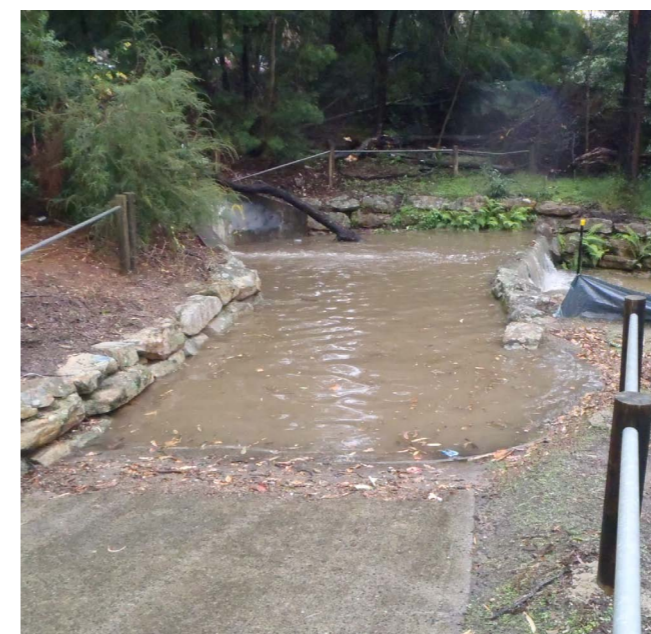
Berowra Oval stormwater collection point following heavy rain
